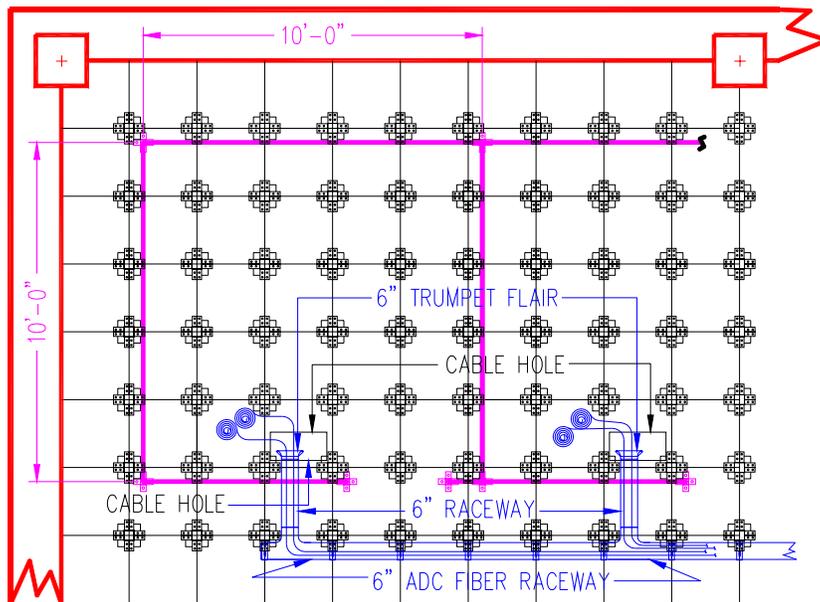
A TYPICAL RAISED FLOOR CAGED COLLOCATION
